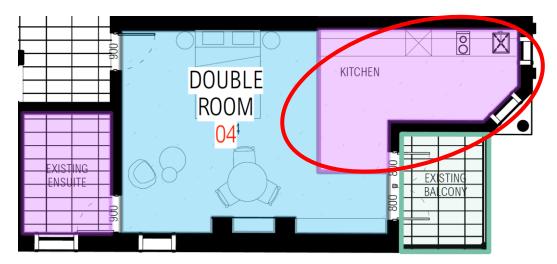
Plan area calculation sheet extract depicting boarding room 04, with the excessive kitchen size circled in red
